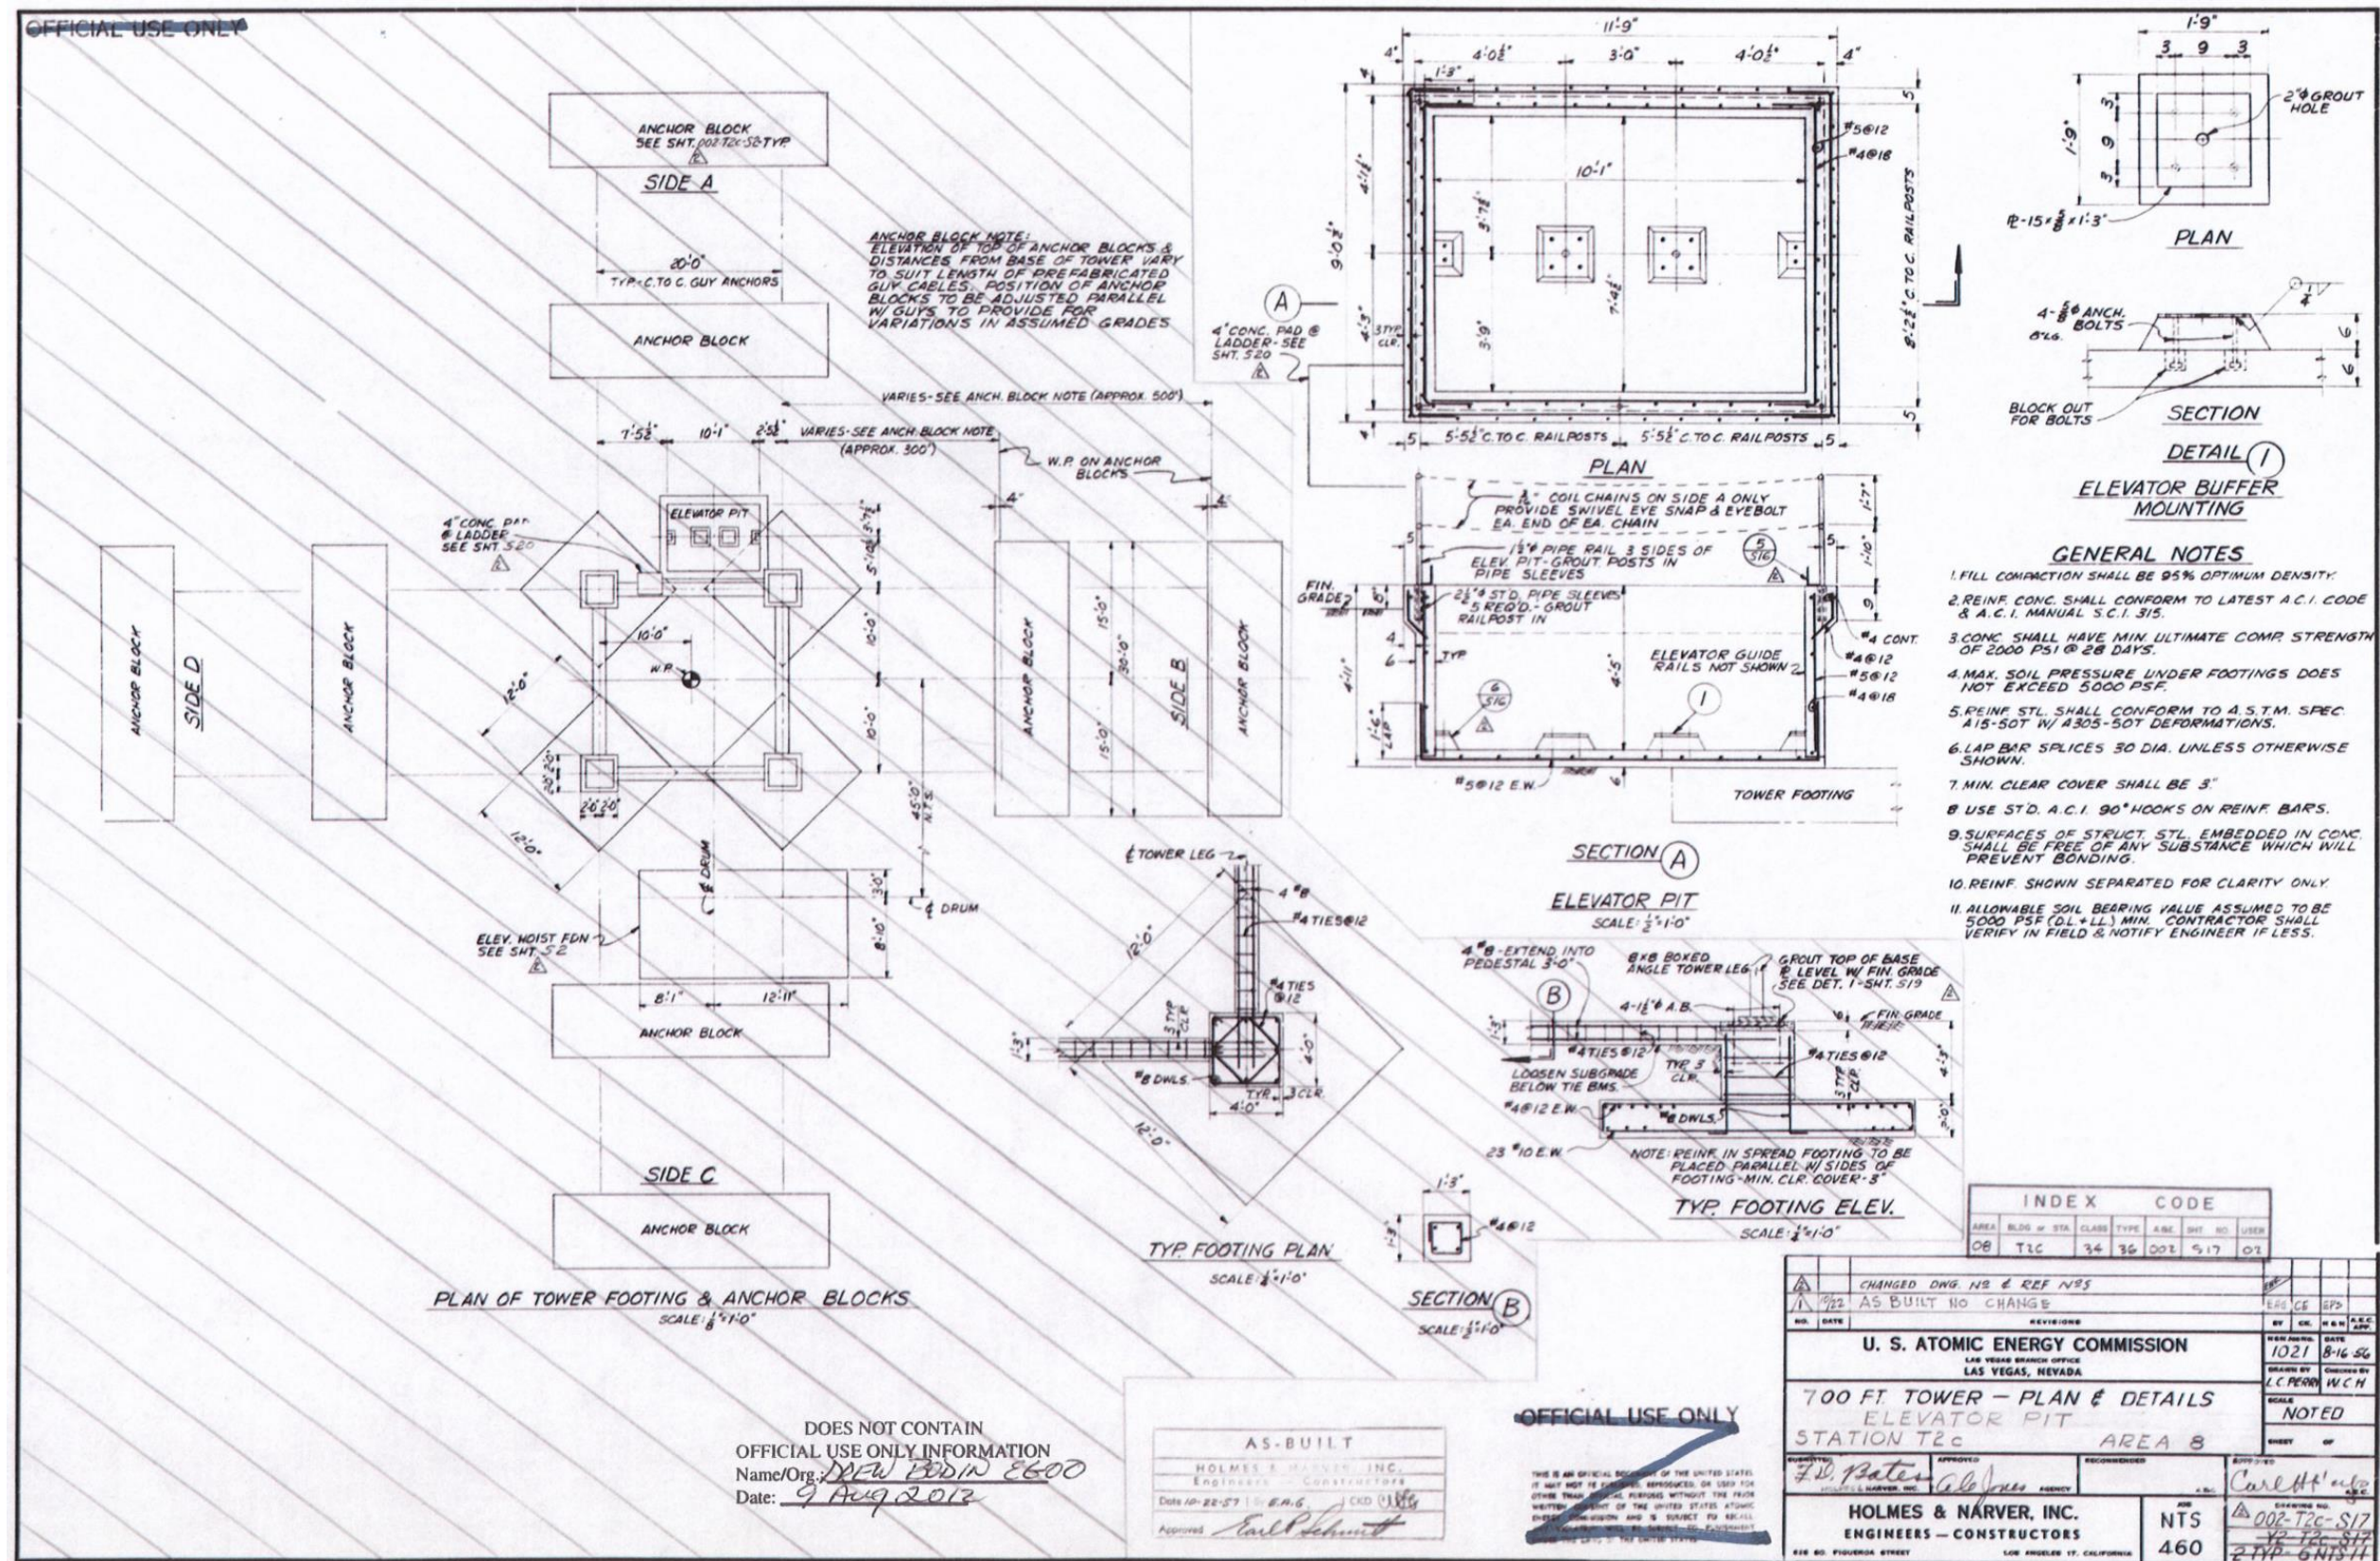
Smoky 700 ft tower cables and anchor blocks for instrumentation cable system, plans, elevations, and details.
